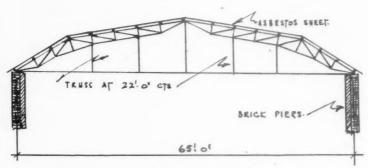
Composite tubular roof truss used in conjunction with brick construction.
